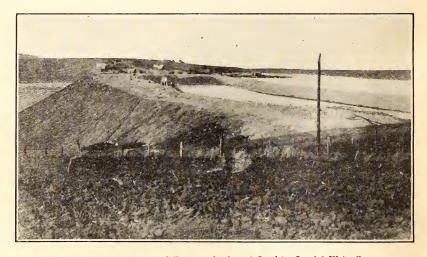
Basin method of building an embankment, Lewiston Land & Water Company,
